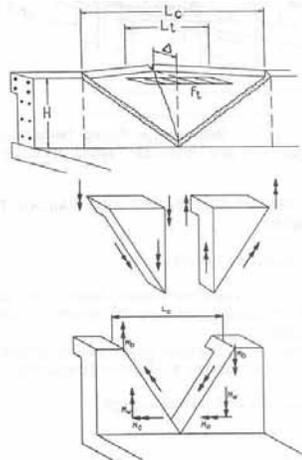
Yield Line Analysis of Concrete Parapet Walls for Impact within Wall Segment
